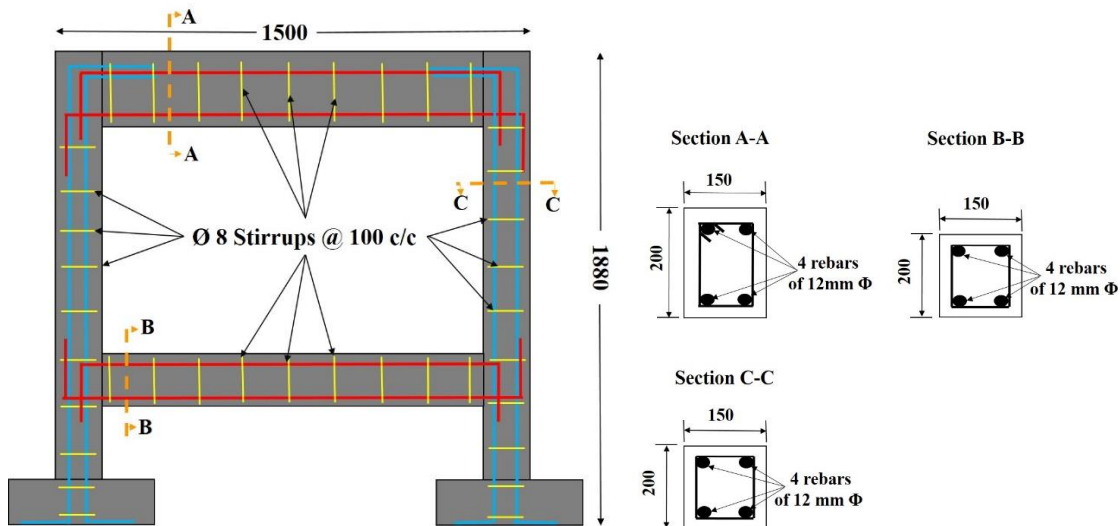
41: Reinforcement details of 2D frame (all dimensions are in mm)
